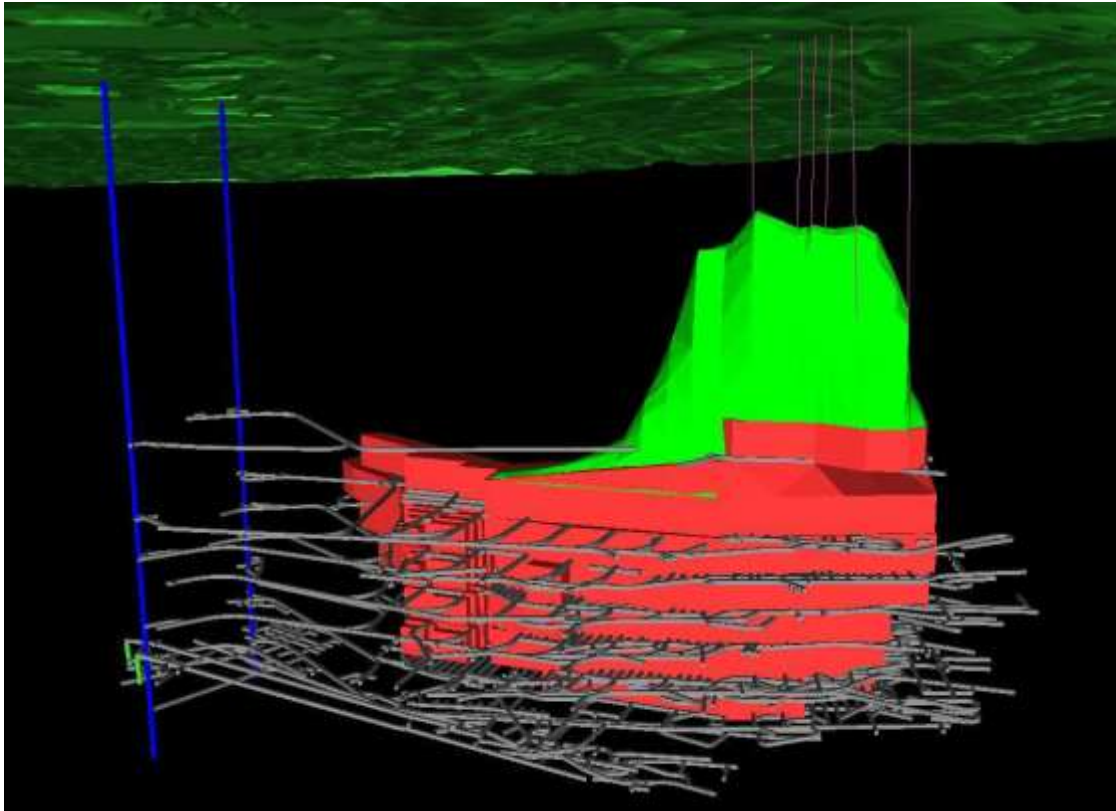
Oblique long section view of Pea Ridge mine layout
